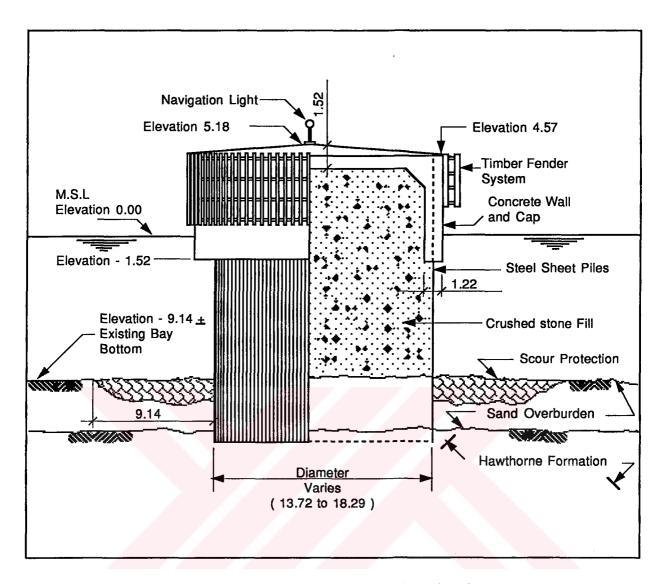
DOLPHIN PROTECTION OF THE SUNSHINE SKYWAY BRIDGE, FLORIDA, USA (In meters)
